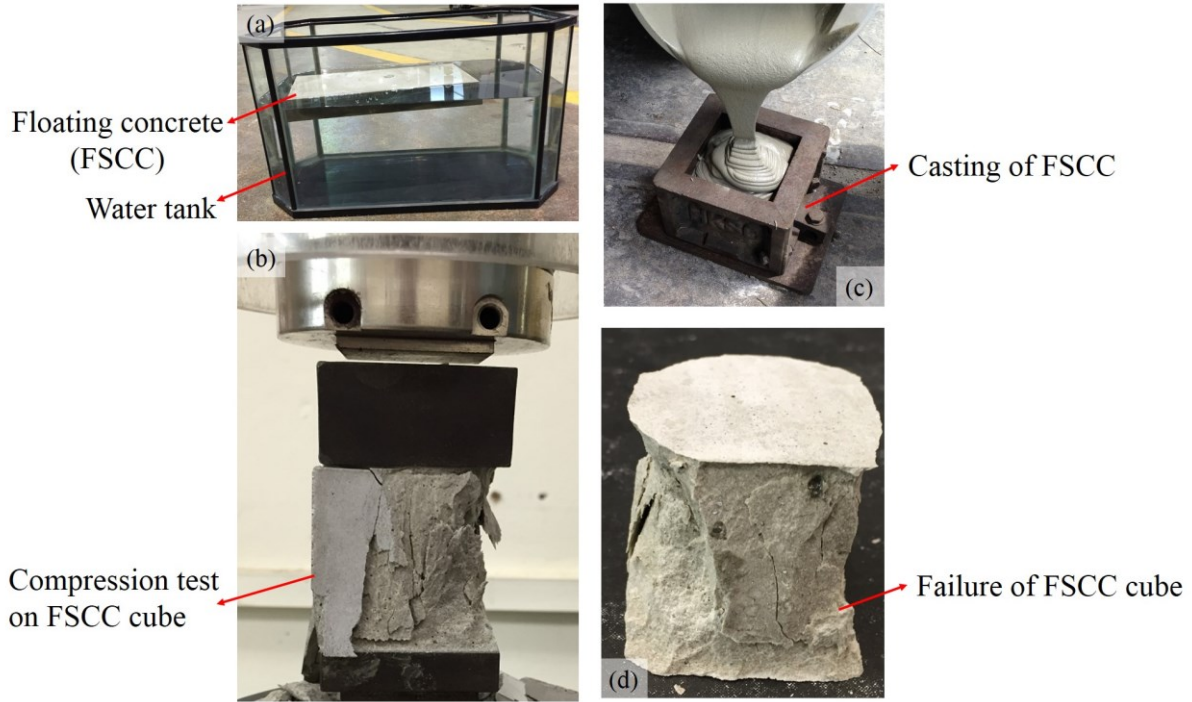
Floating concrete FSCC (a) sample in water (b) FSCC cube under compression (c) casting of FSCC (d) Failure of FSCC cube.
